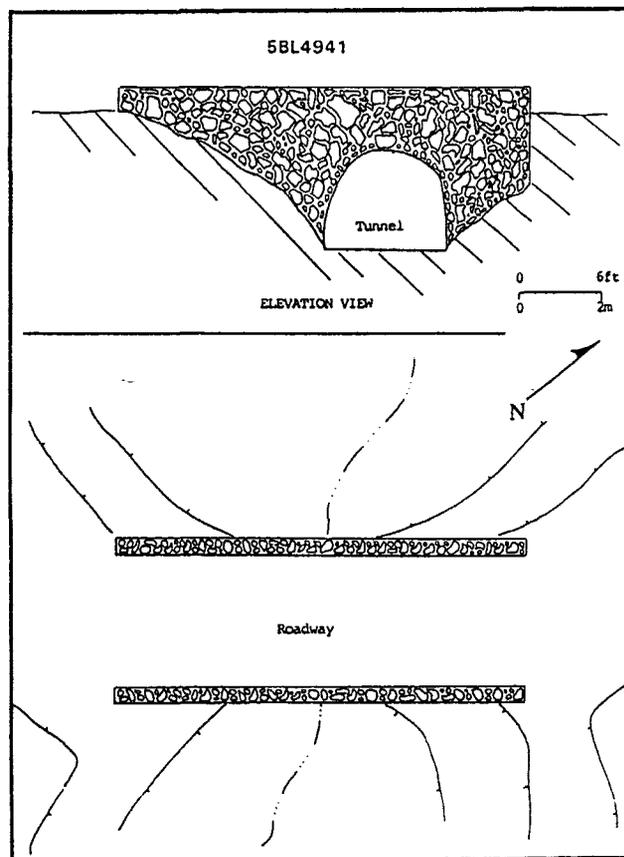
Plan and profile of Enchanted Mesa Bridge.
